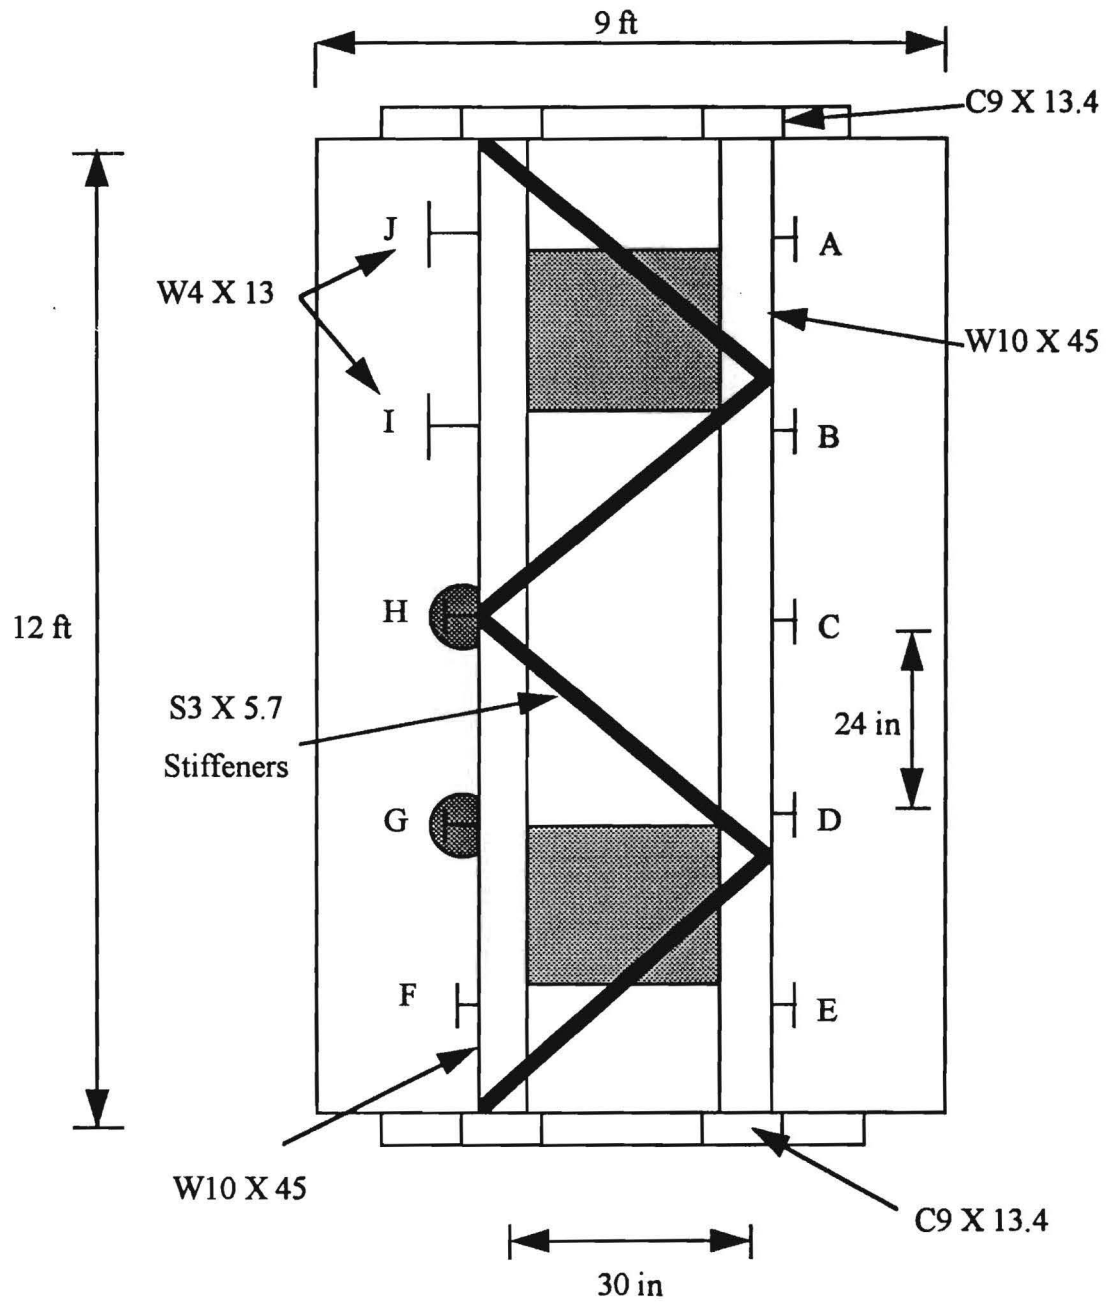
Plan View of Experimental Facility for Testing Small-Scale Piles
